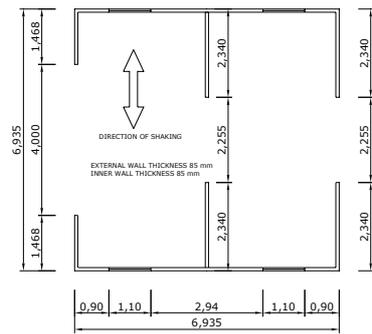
Opening layout of 1<sup>st</sup> storey walls for Phase A, B and C respectively.
